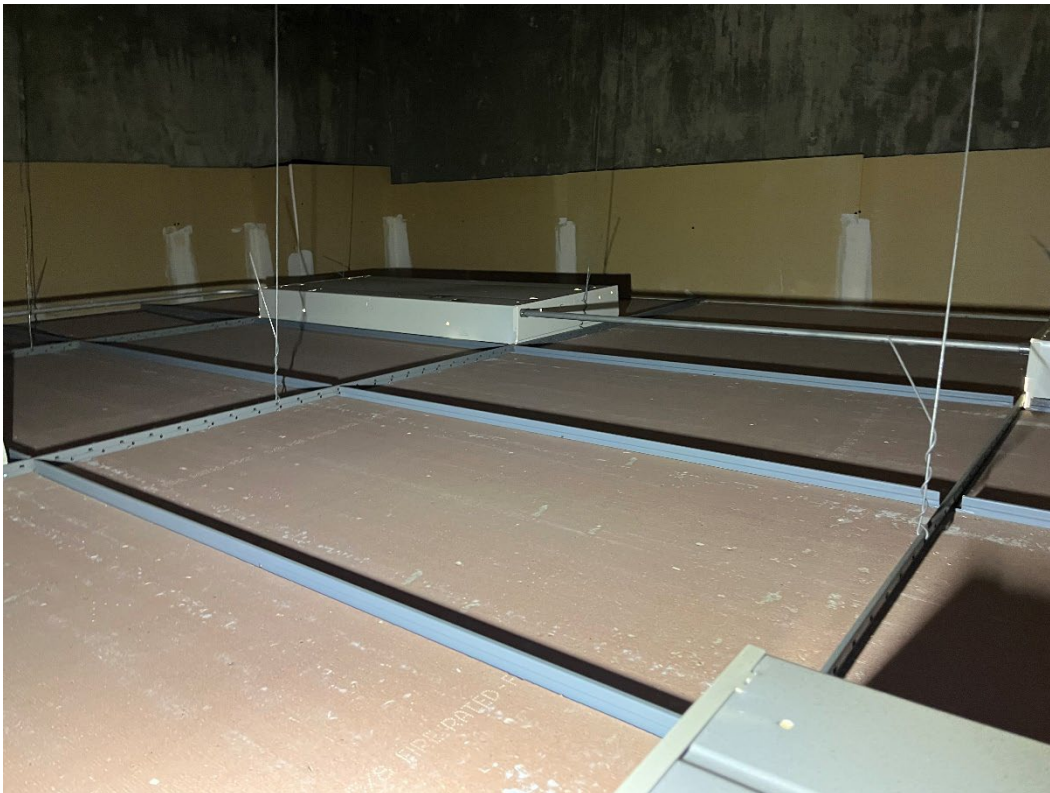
View of asbestos ceiling tiles – Level 1 – Vault D.
